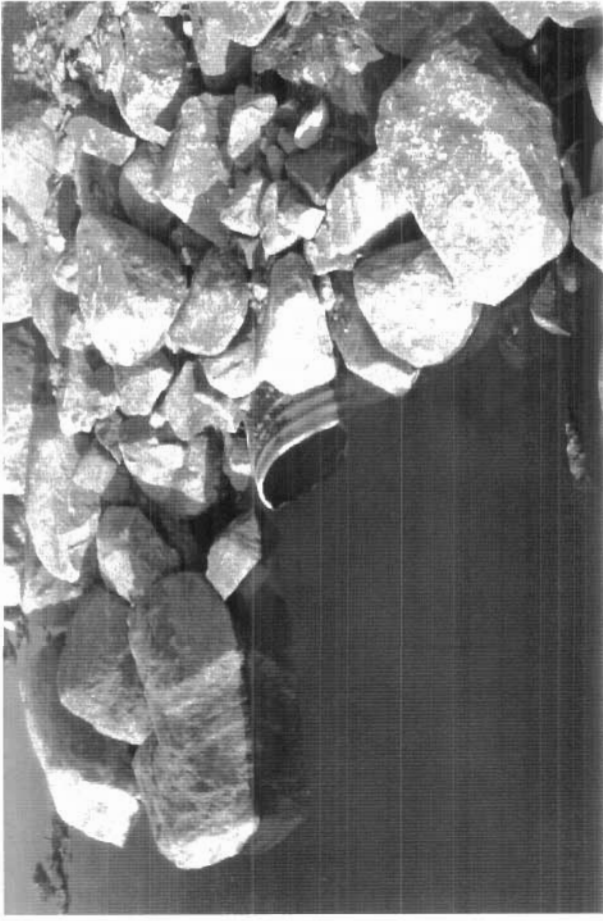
Km 24 Culvert, 30 June 2002. Ponding of water on upstream side of culvert. Note: additional culverts are needed to maintain flow between the river and the lake. Fish passage possible through the culvert.
